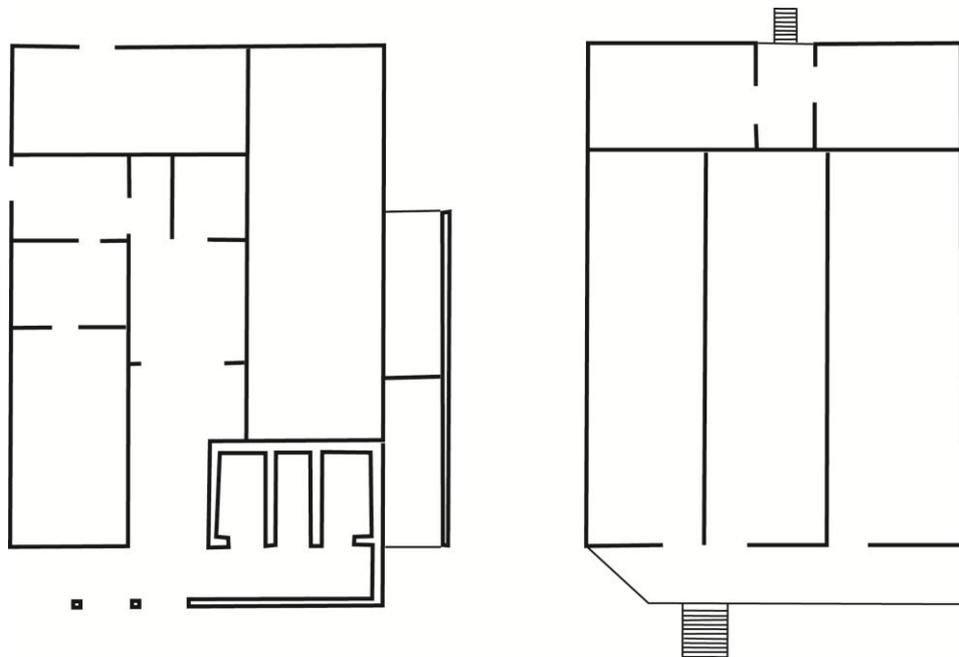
, Overdrawing of above plan of 1947(ground floor to left, first floor to right)
